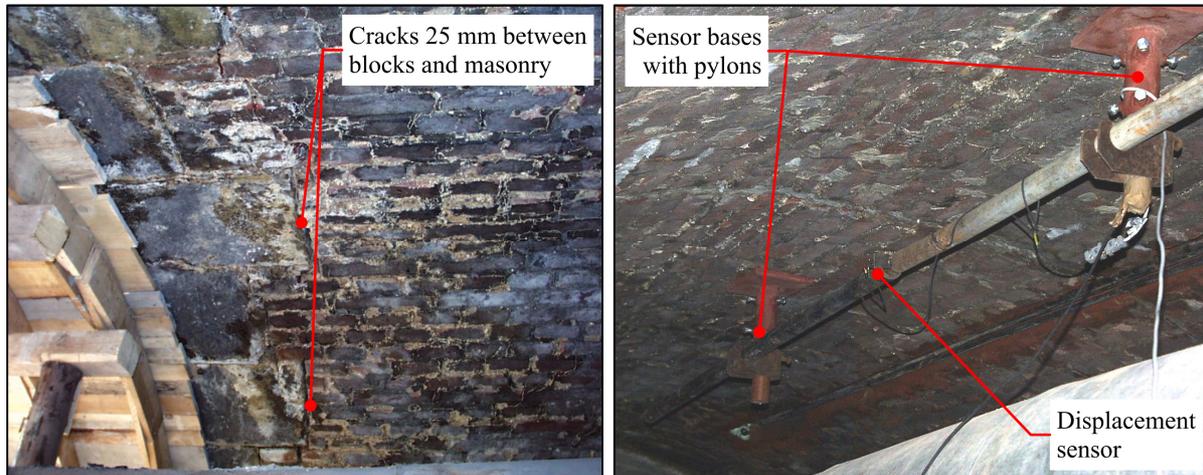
Defects in vault and sensor base; left - cracks between face wall blocks and masonry caused by buckling; right – sensor base in the crown with displacement sensor.
